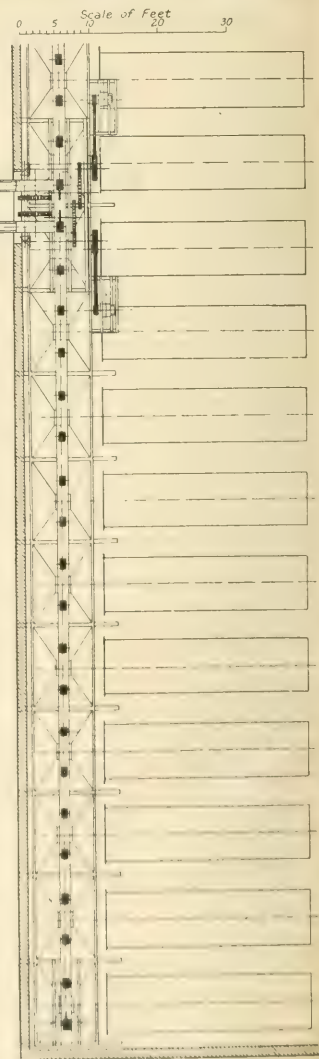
COAL HANDLING AND STORAGE PLANT.
